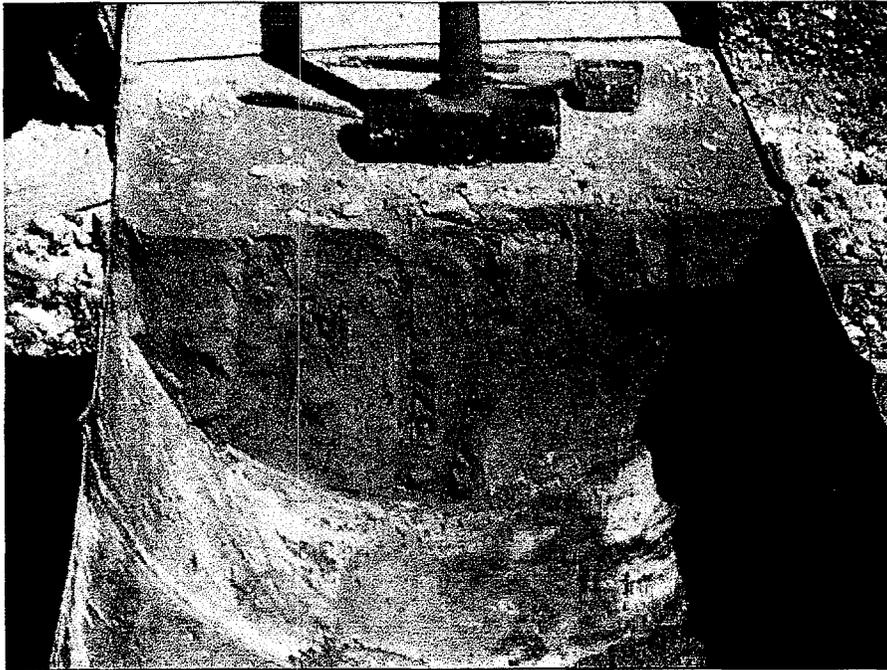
Grout Removed to ~ 6 in. from Drum End in Test 2. Grout appears uniform.
